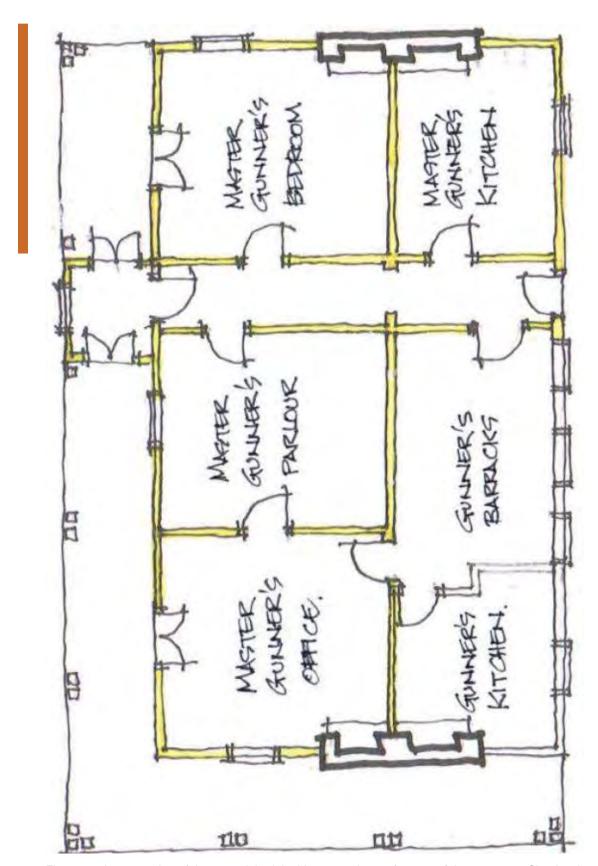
Interpretation of the potential original layout and use of rooms of the cottage at Shepherds Hill. This layout is considered to be the general standard layout used for Gunner's Cottage in the late 19th century. (Source: Carr, John, Shepherds Hill Cottage Storm Damage Repairs SoHl Rev E, February 2017, p.8)
